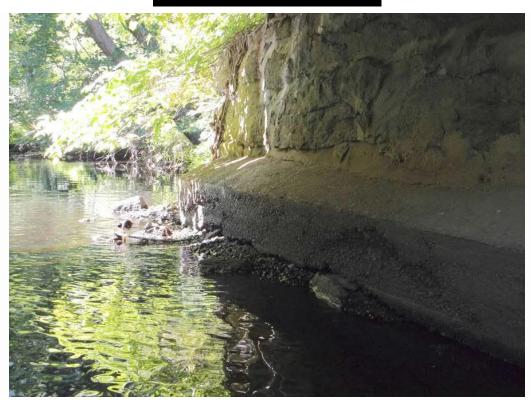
West concrete apron looking Southwest, abrasion and undermining.
